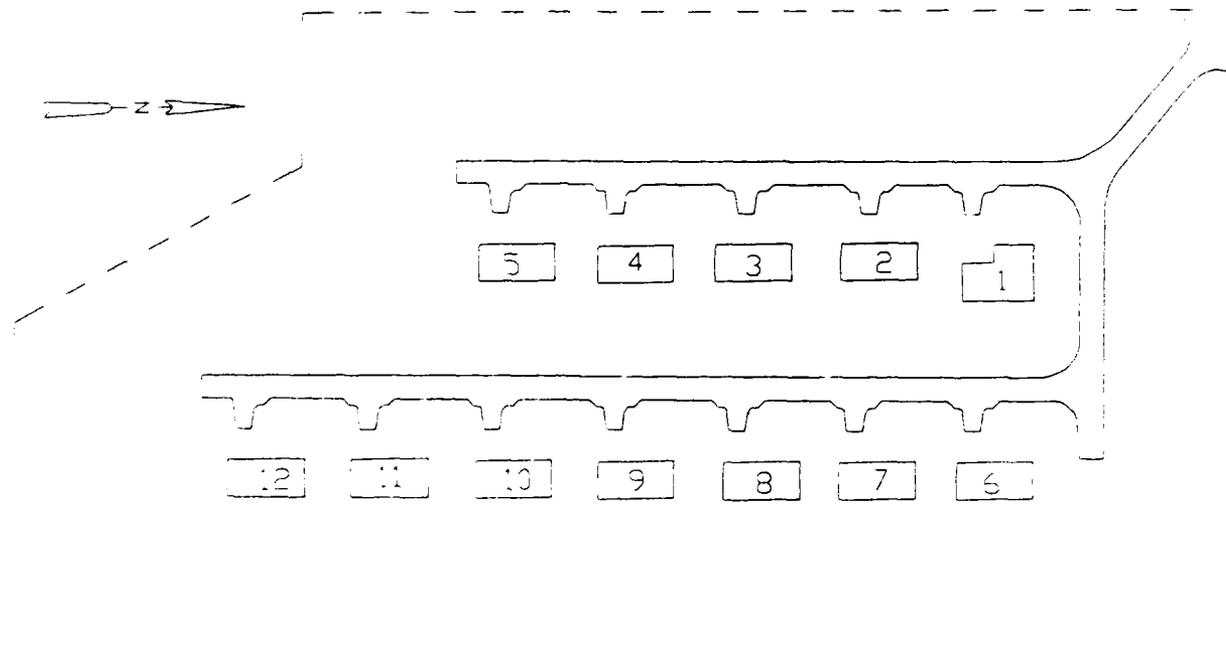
Site Plan Map of Rural Ridge Army Housing Units
